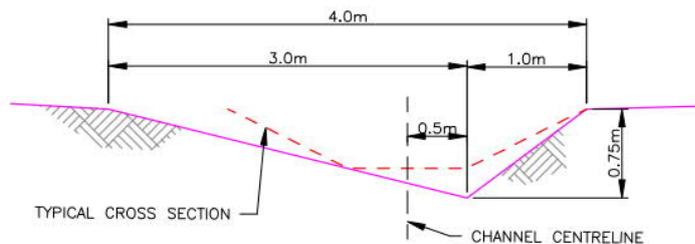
Typical geometric shape of a bend apex pool cross-section in comparison to a normal trapezoidal section.
